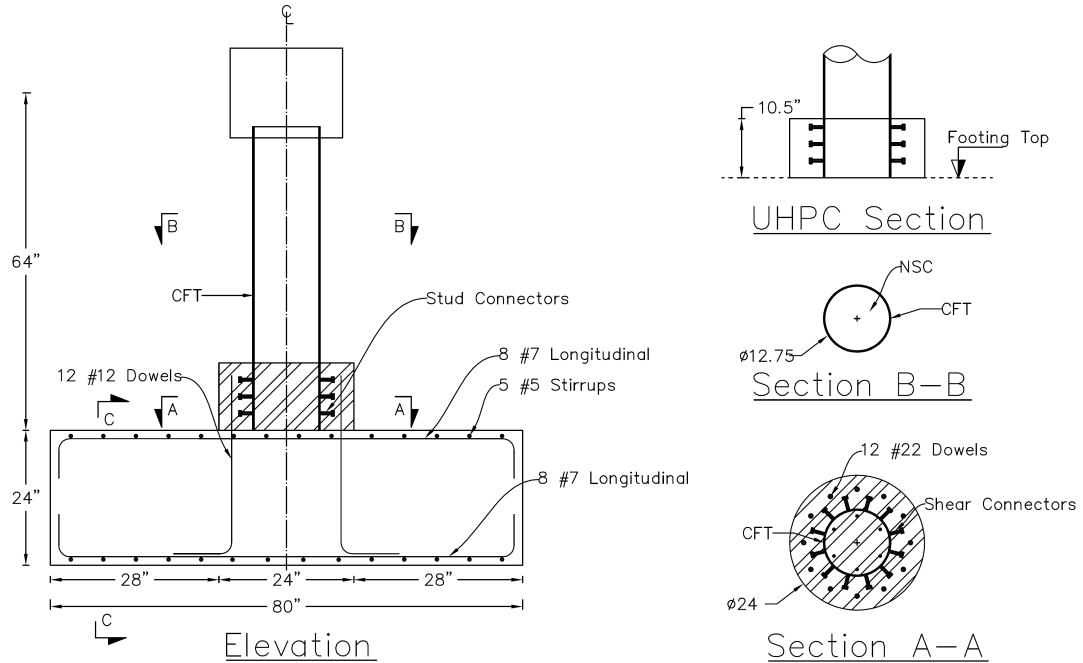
Schematic detail of specimen-2 showing dimensions and reinforcement details.
